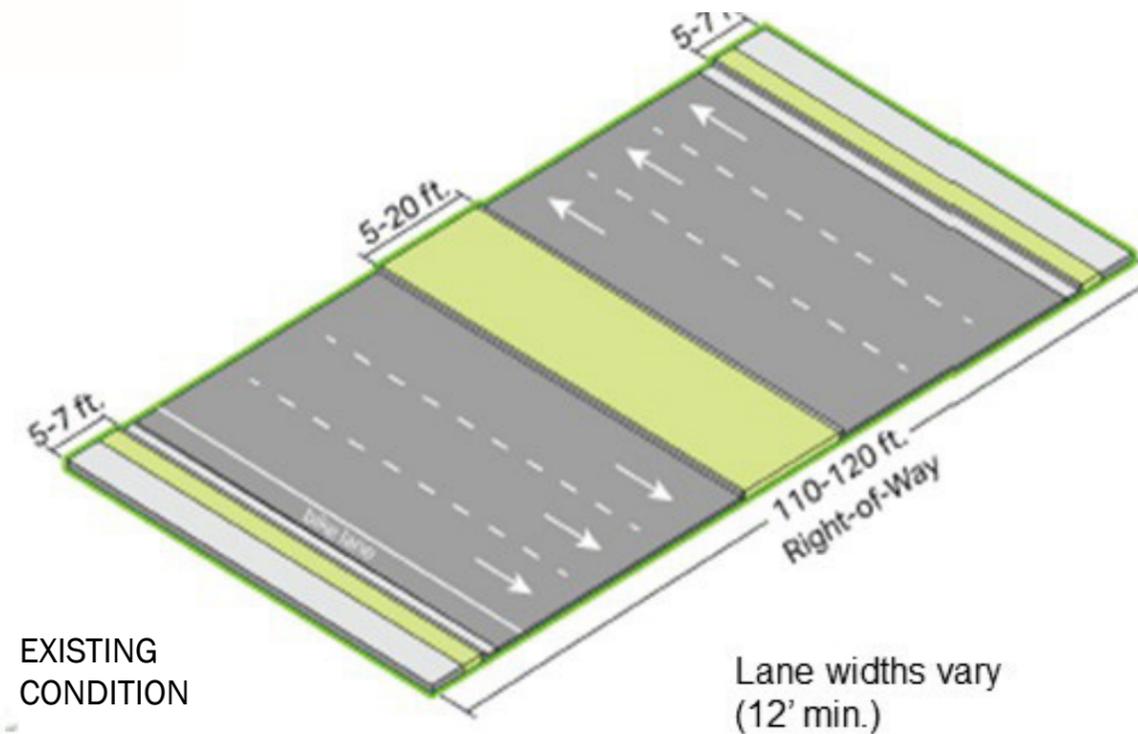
Imagery depicting Langston Boulevard Typical Cross sections
